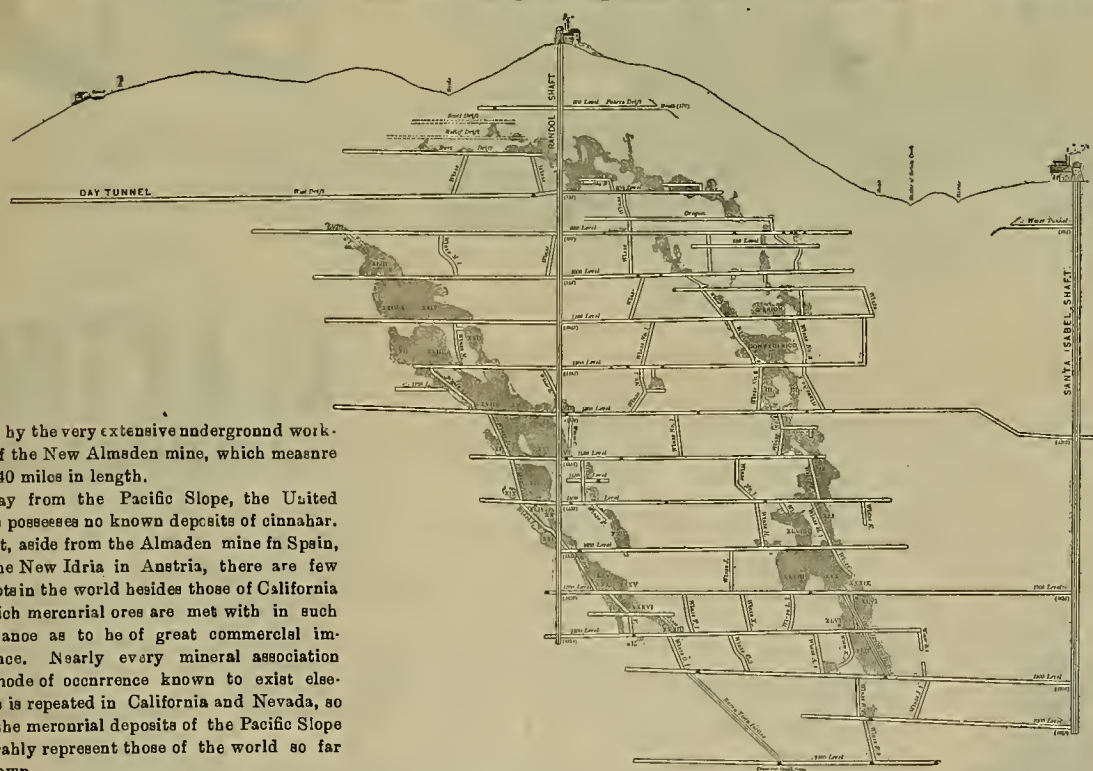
EAST AND WEST VERTICAL SECTION, NEW ALMADEN MINE.
